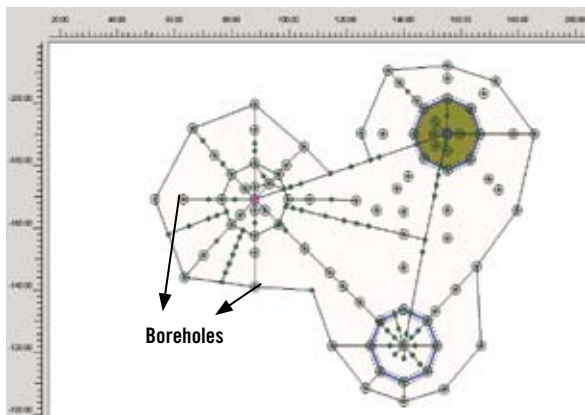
3D FE structure-foundation model, 2D build-up, horizontal plane at S1 level, -14.5 m
